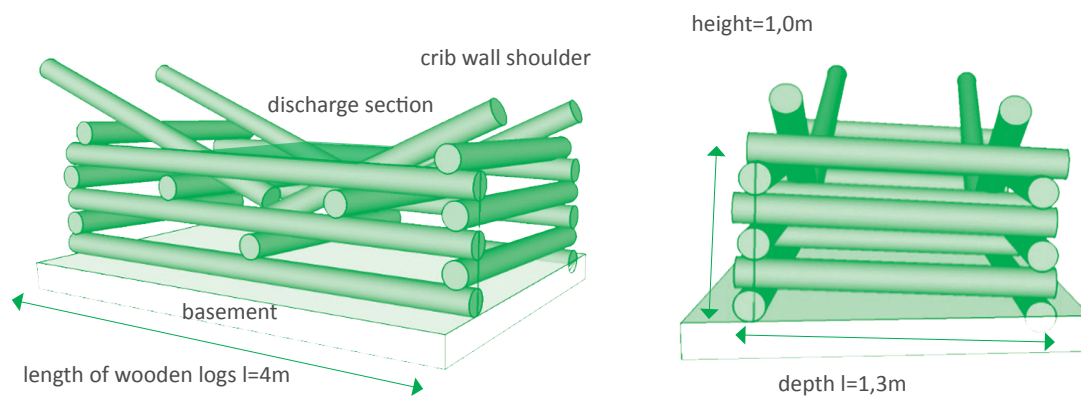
3D views of the wooden structure of the vegetated crib wall (Rauch et al. 2016).
